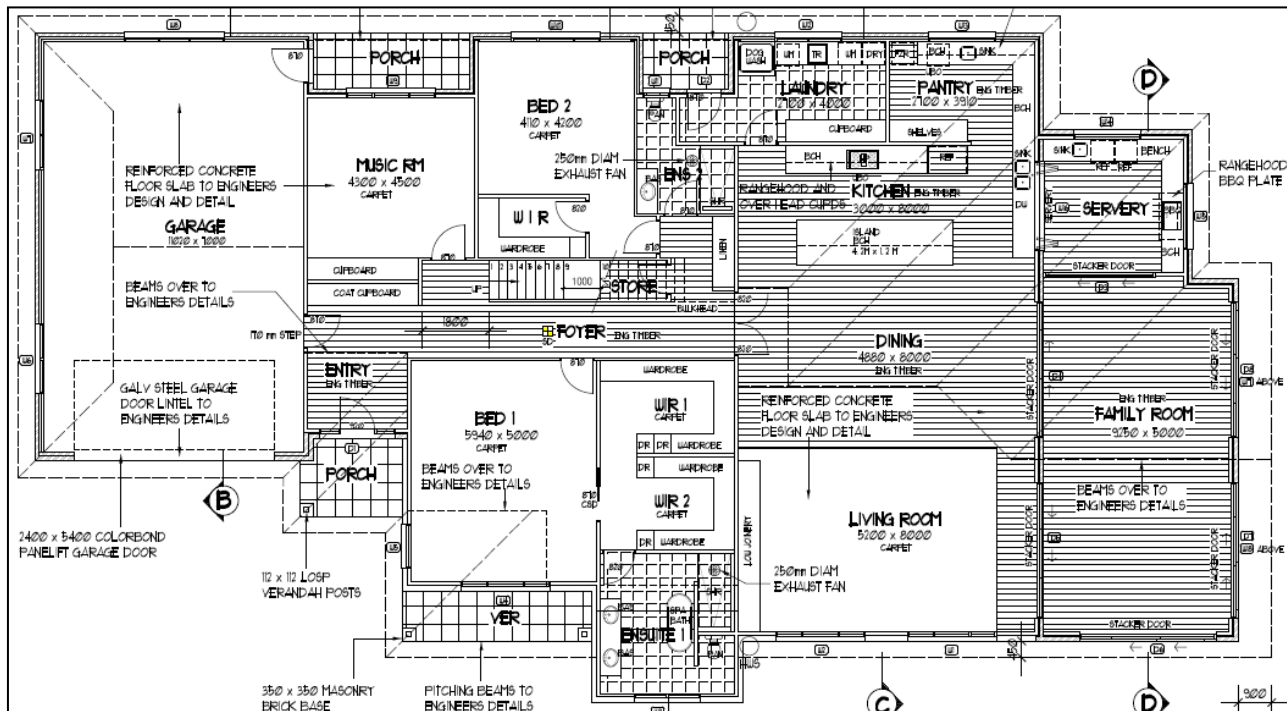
Ground Floor – dlb Design Group, September, 2025
